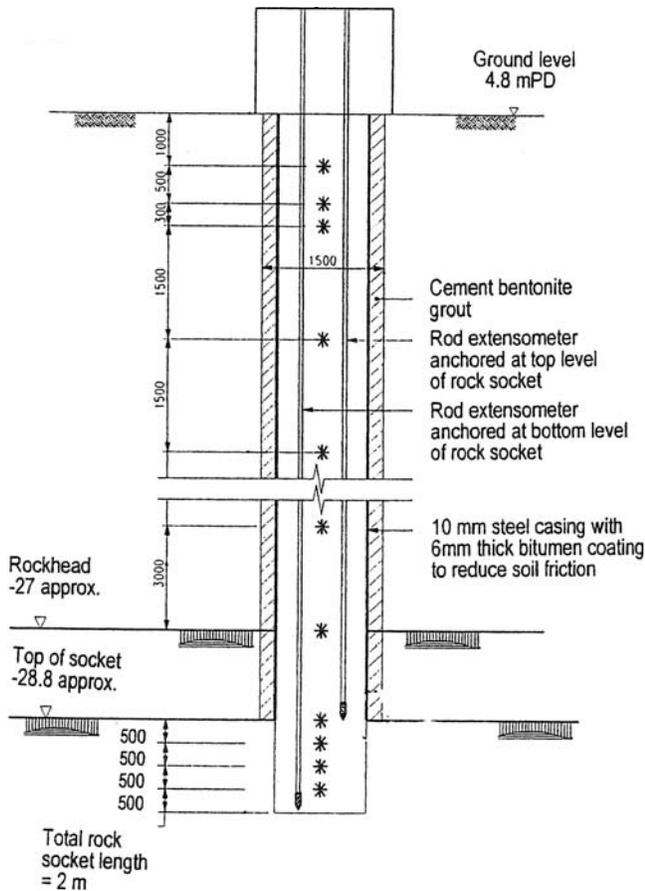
Details of instrumented rock-socketed shaft (Zhan and Yin 2000).
